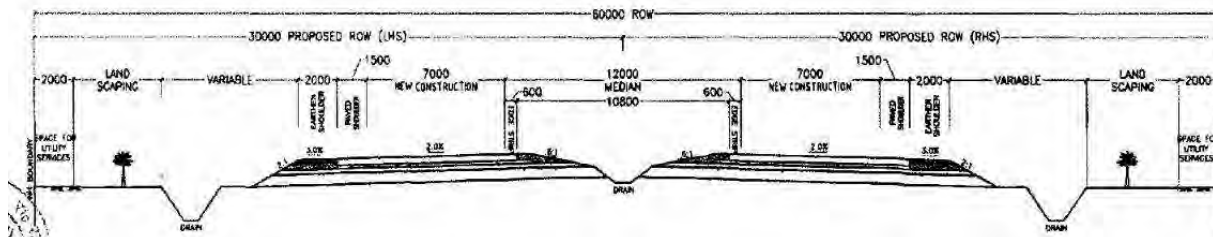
Typical Cross Section for new construction without service road (TCS-1)
